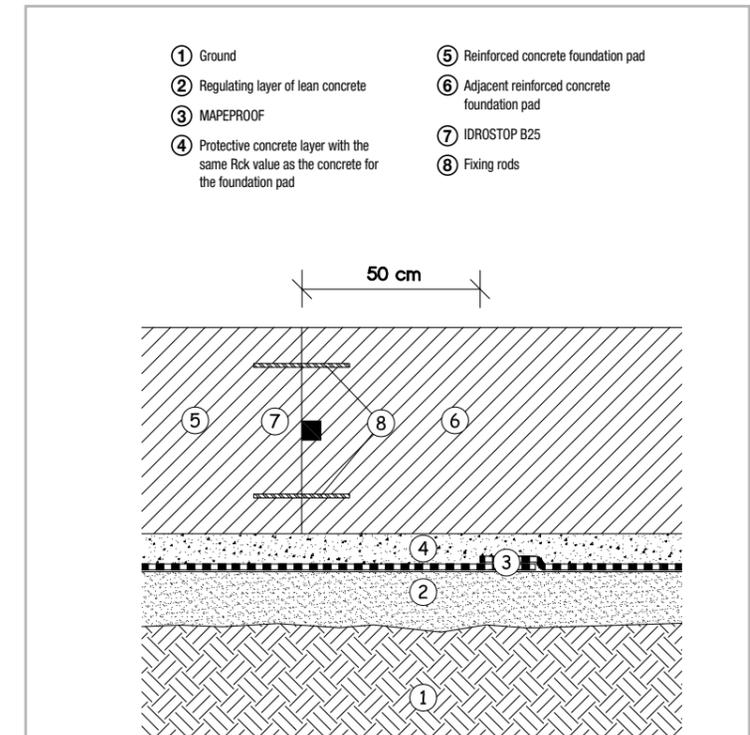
Detailed layout of sealing a construction joint on a foundation pad
